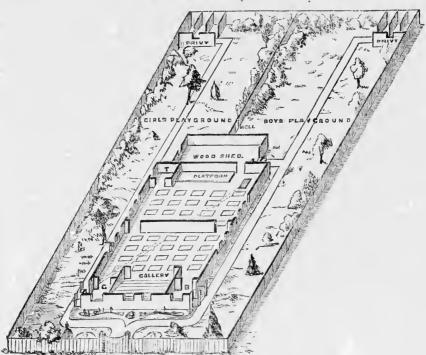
Block Plan of School-House and Grounds, adapted to Design No. 21, Fig. 93. T. Teacher's closet.
